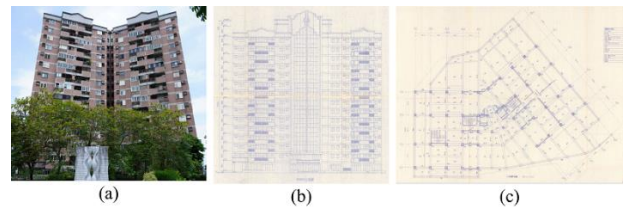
(a) street view, (b) elevation view, and (c) plan view of Building O67.
